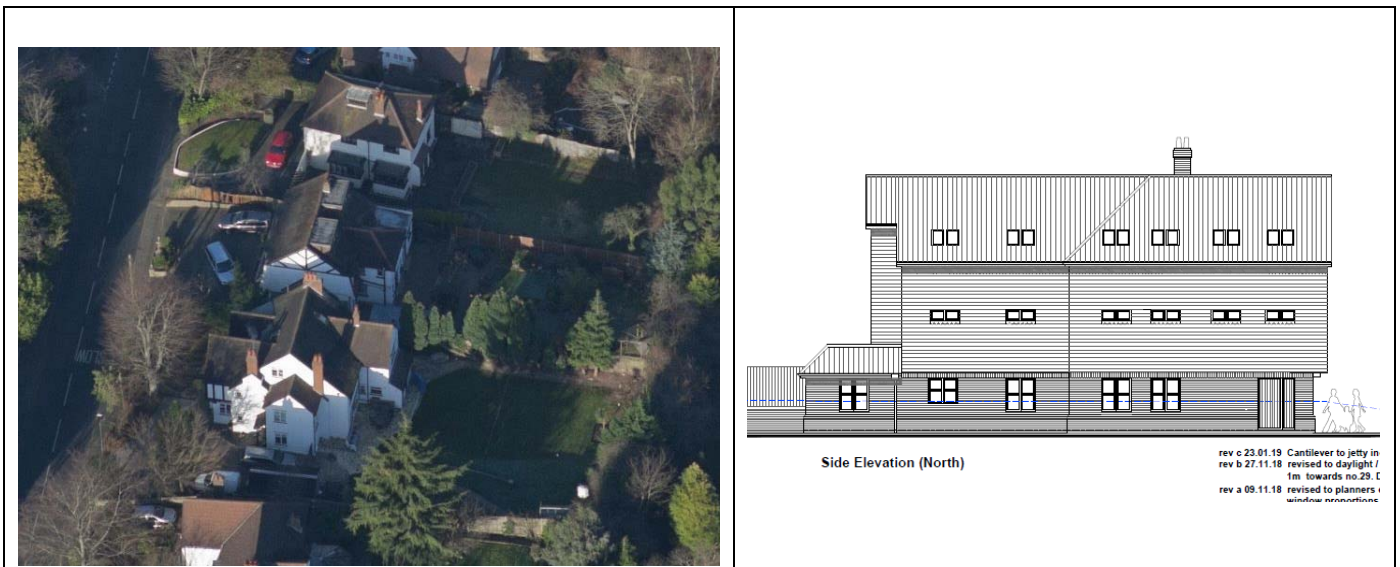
Existing relationship with 29 Riddlesdown Road and proposed facing flank elevation
